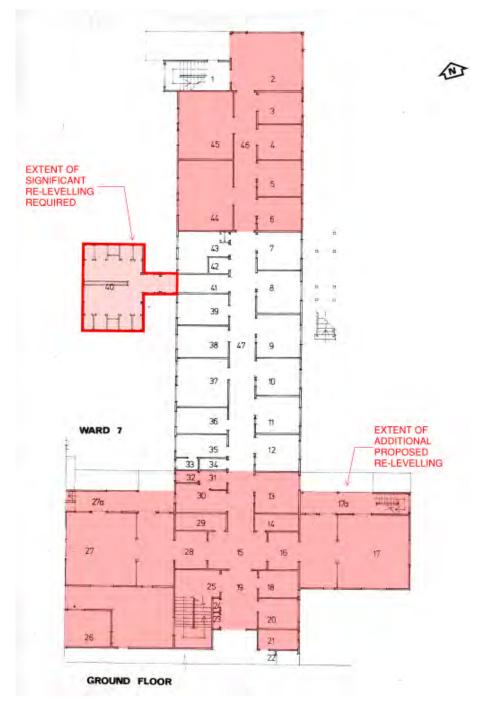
Foundation Plan – Damage Repairs
